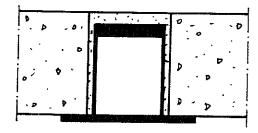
a. Floor girder partially built into, and insulated by, the floor slab
